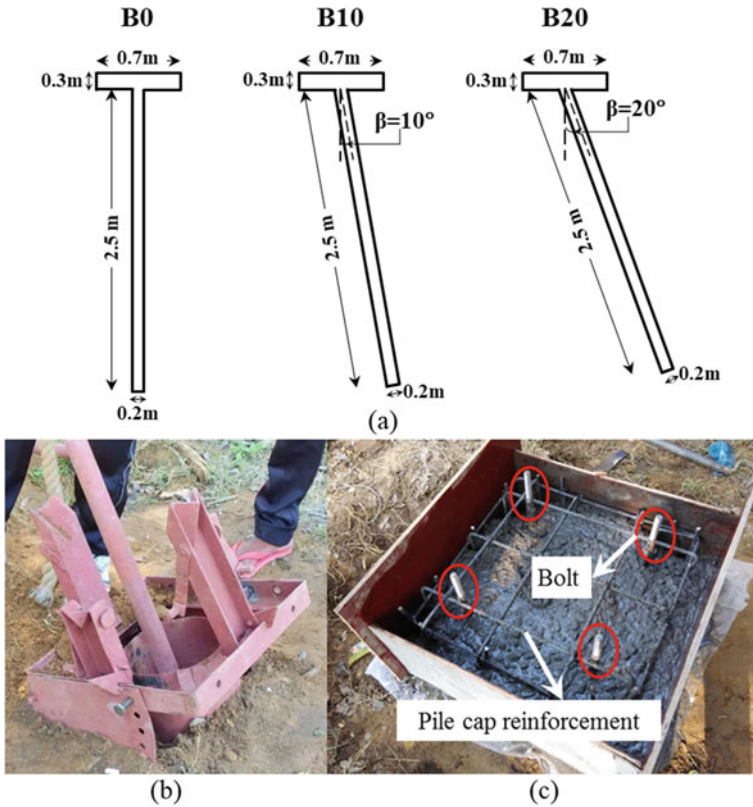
a Geometry of piles; b boring guide; and c pile cap reinforcement cage with bolts
